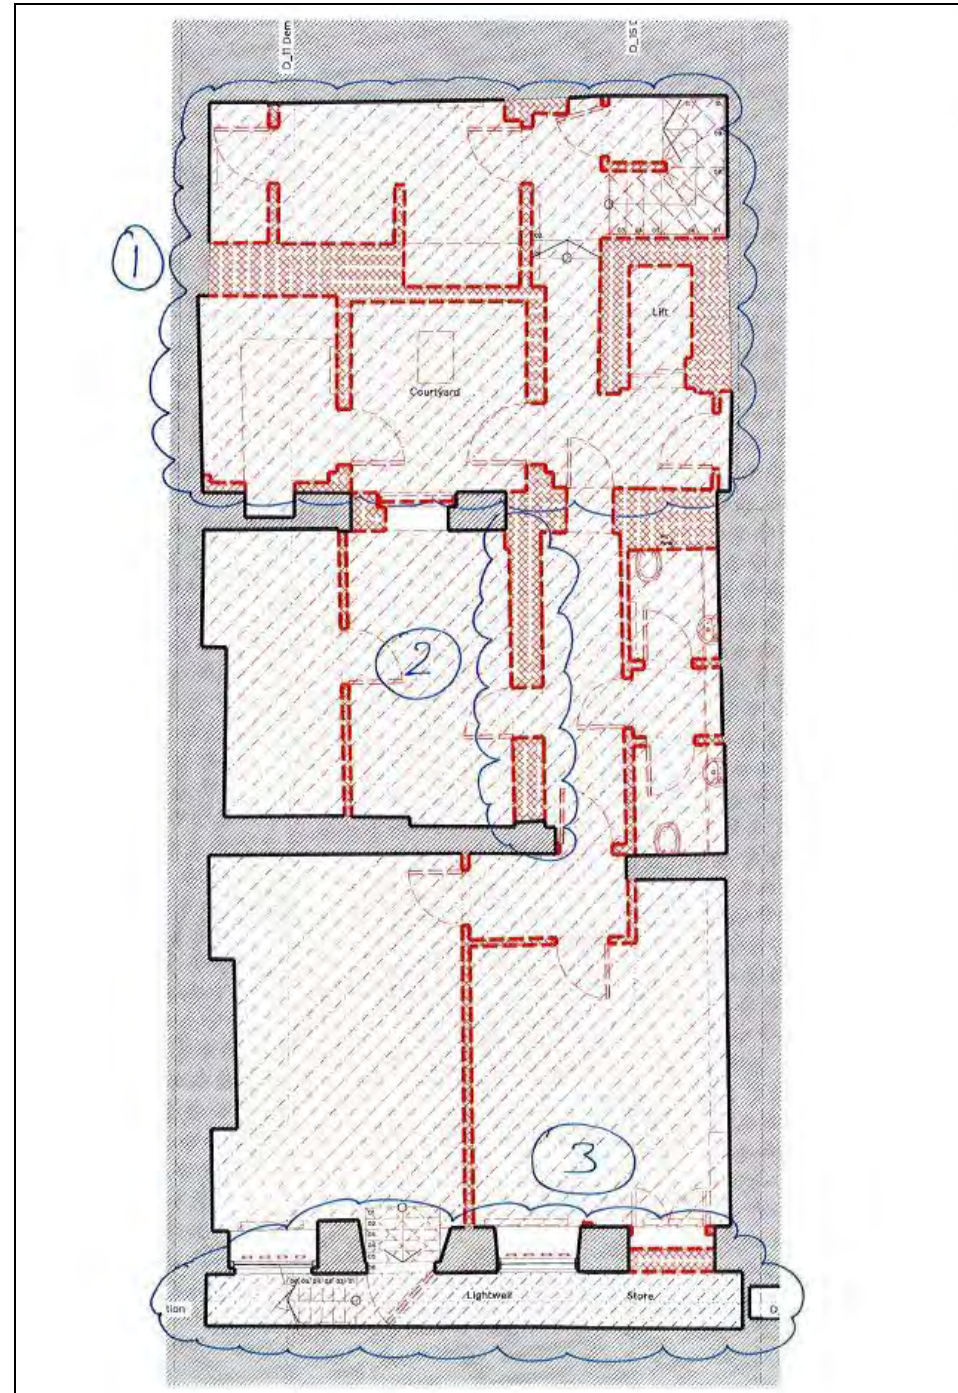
Existing Lower Ground Floor Layout (demolition shown hatched red)
